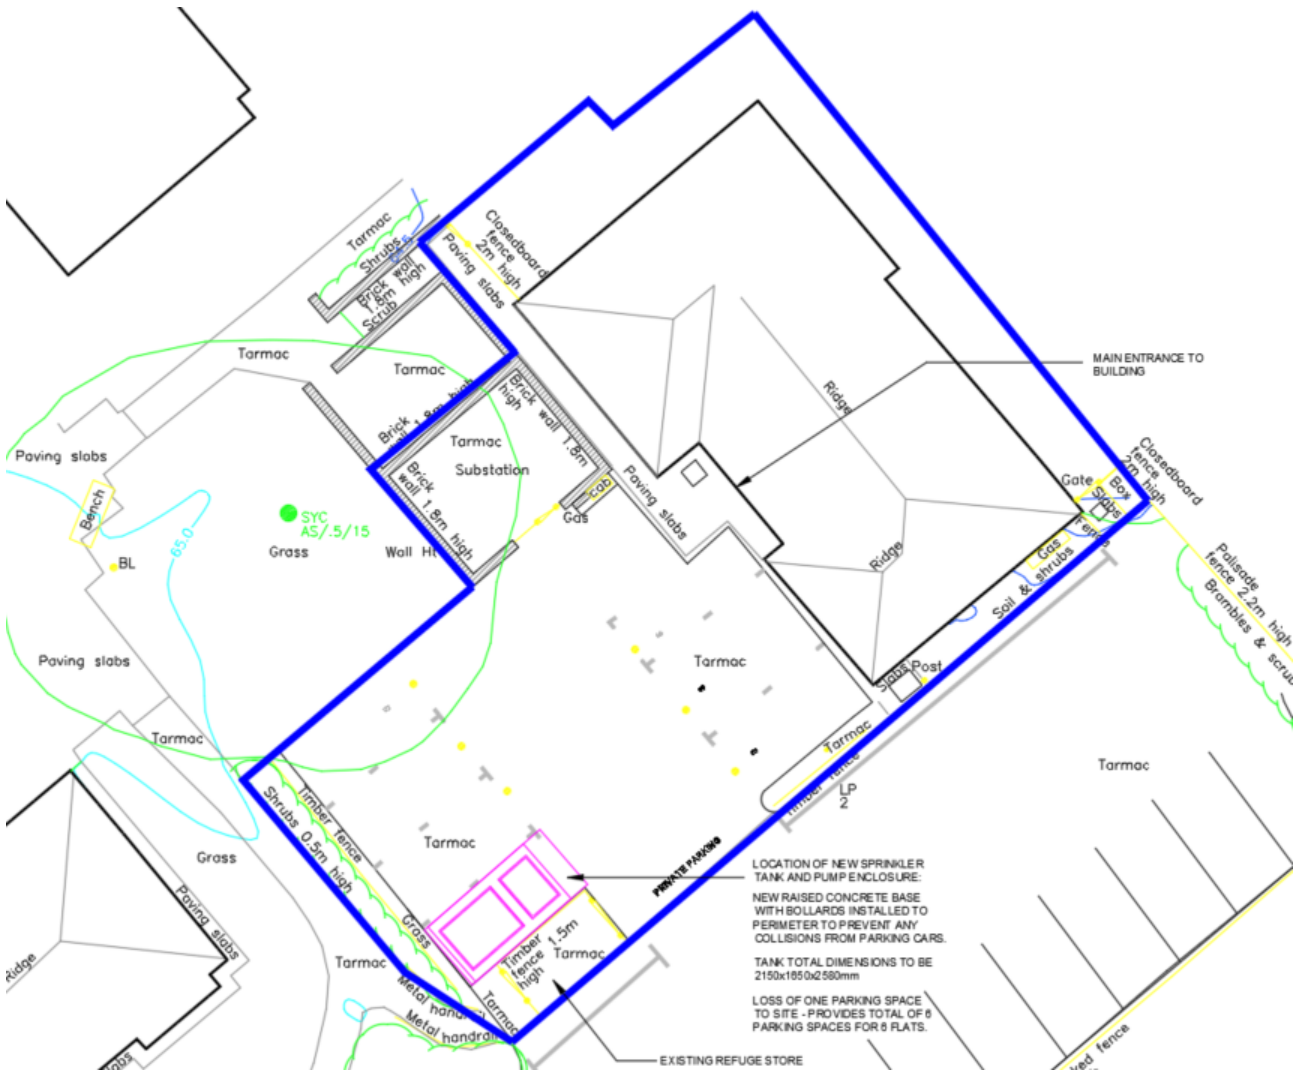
Proposed site plan (5018969-RDG-XX-ST-PL-B-0102)
